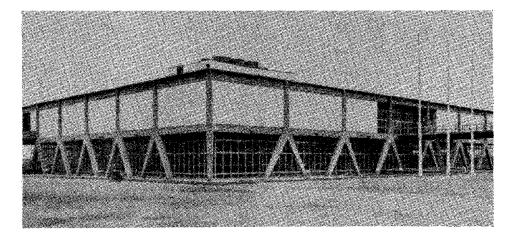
Braced first floor. Tokyo International Trading Center, Tokyo, Japan. Masachika Murata, architect & associates.
